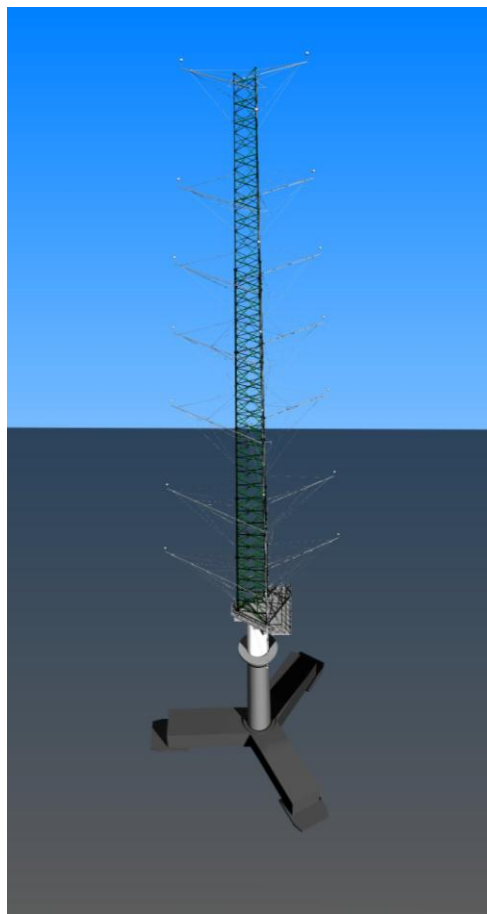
Prestressed concrete gravity foundation for the tower in Arkona Basin in the Baltic Sea
